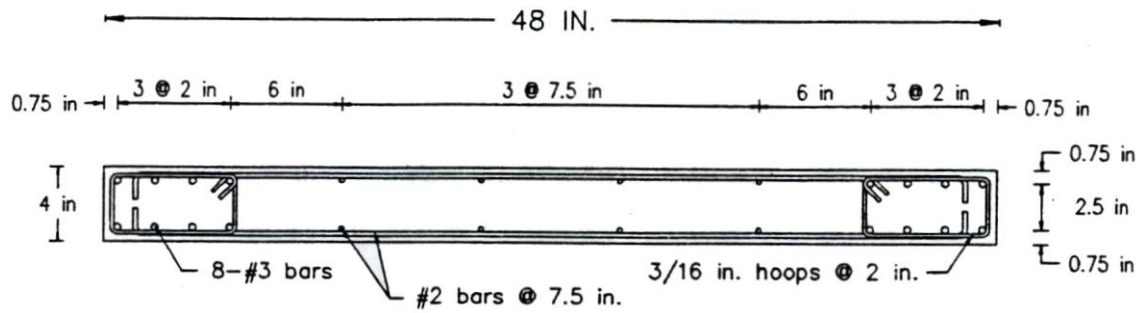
Section of Rectangular Wall RW2 Tested by Thomsen and Wallace [1995]
